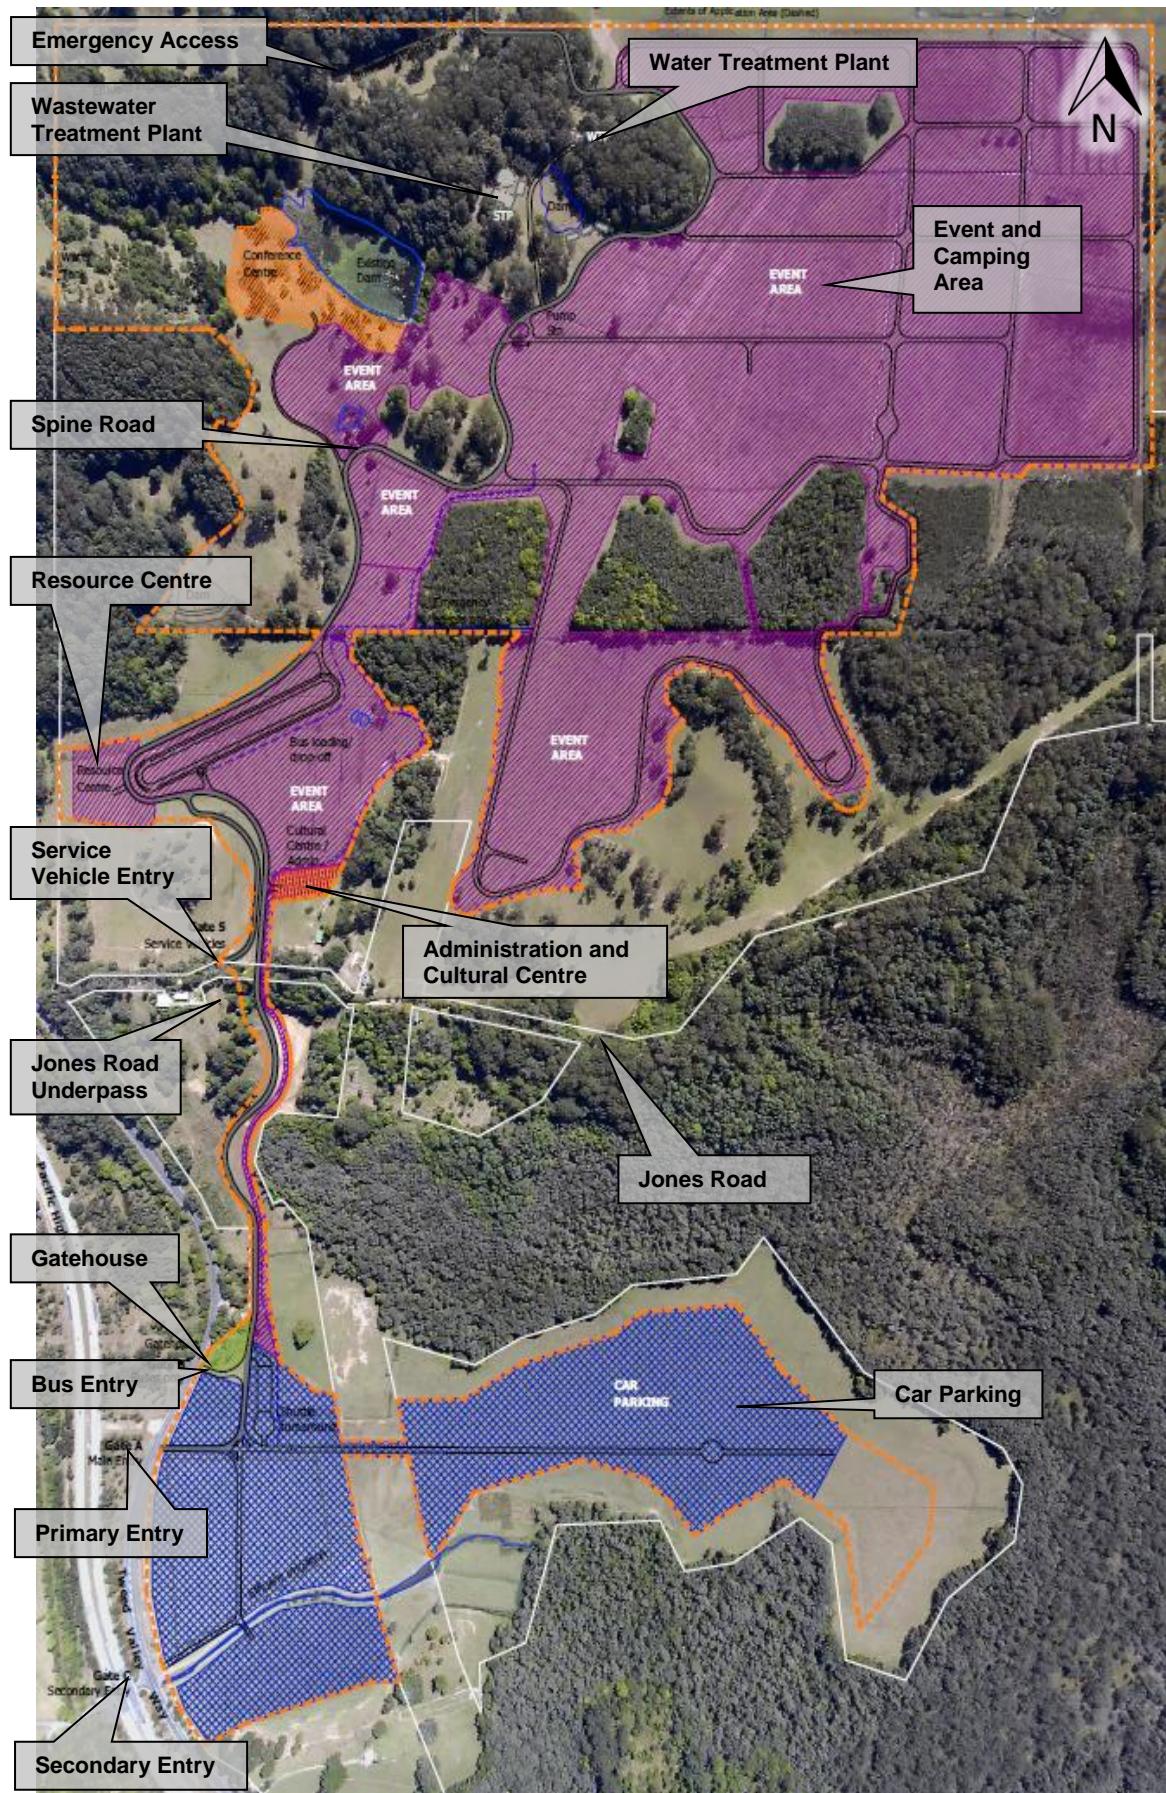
Cultural Events Site – Approved Project Layout – Stages 1 and 2 (MP 09_0028)
